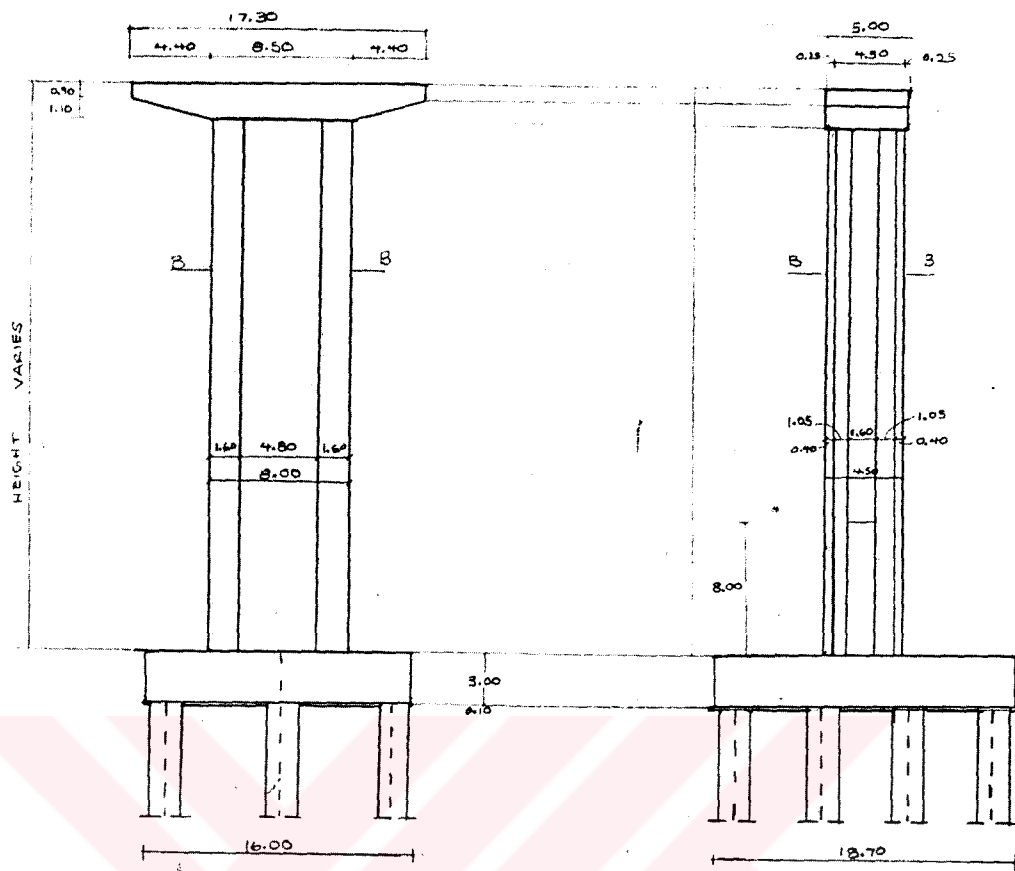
Typical Pier Elevation (dimensions in meter)
